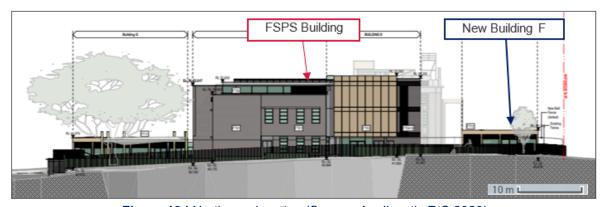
| Northern elevation (Source: Applicant's RtS 2020)
